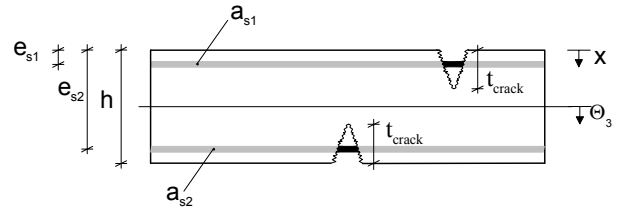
Shift of axis of inertia for a cracked reinforced concrete cross section
